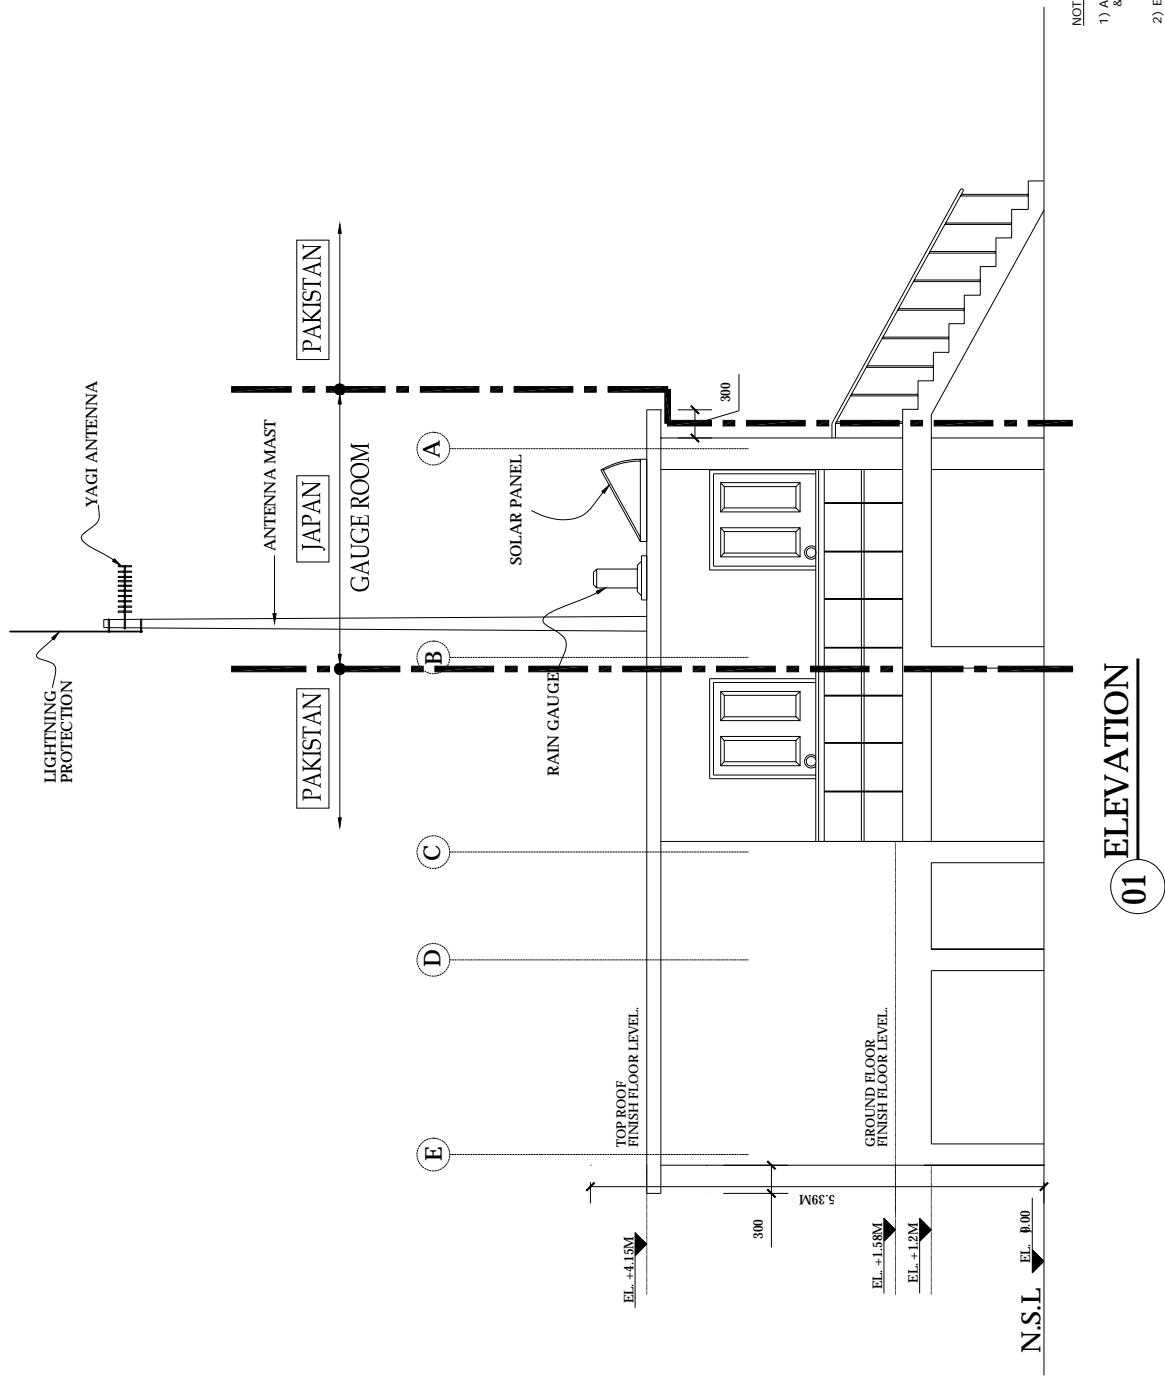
Elevation of Rainfall Gauging Station (Golra)
